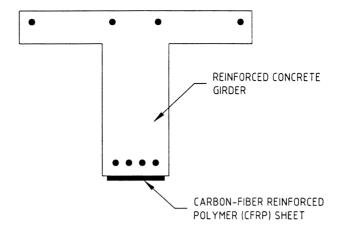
Strengthening of reinforced concrete girder using CFRP laminate.
